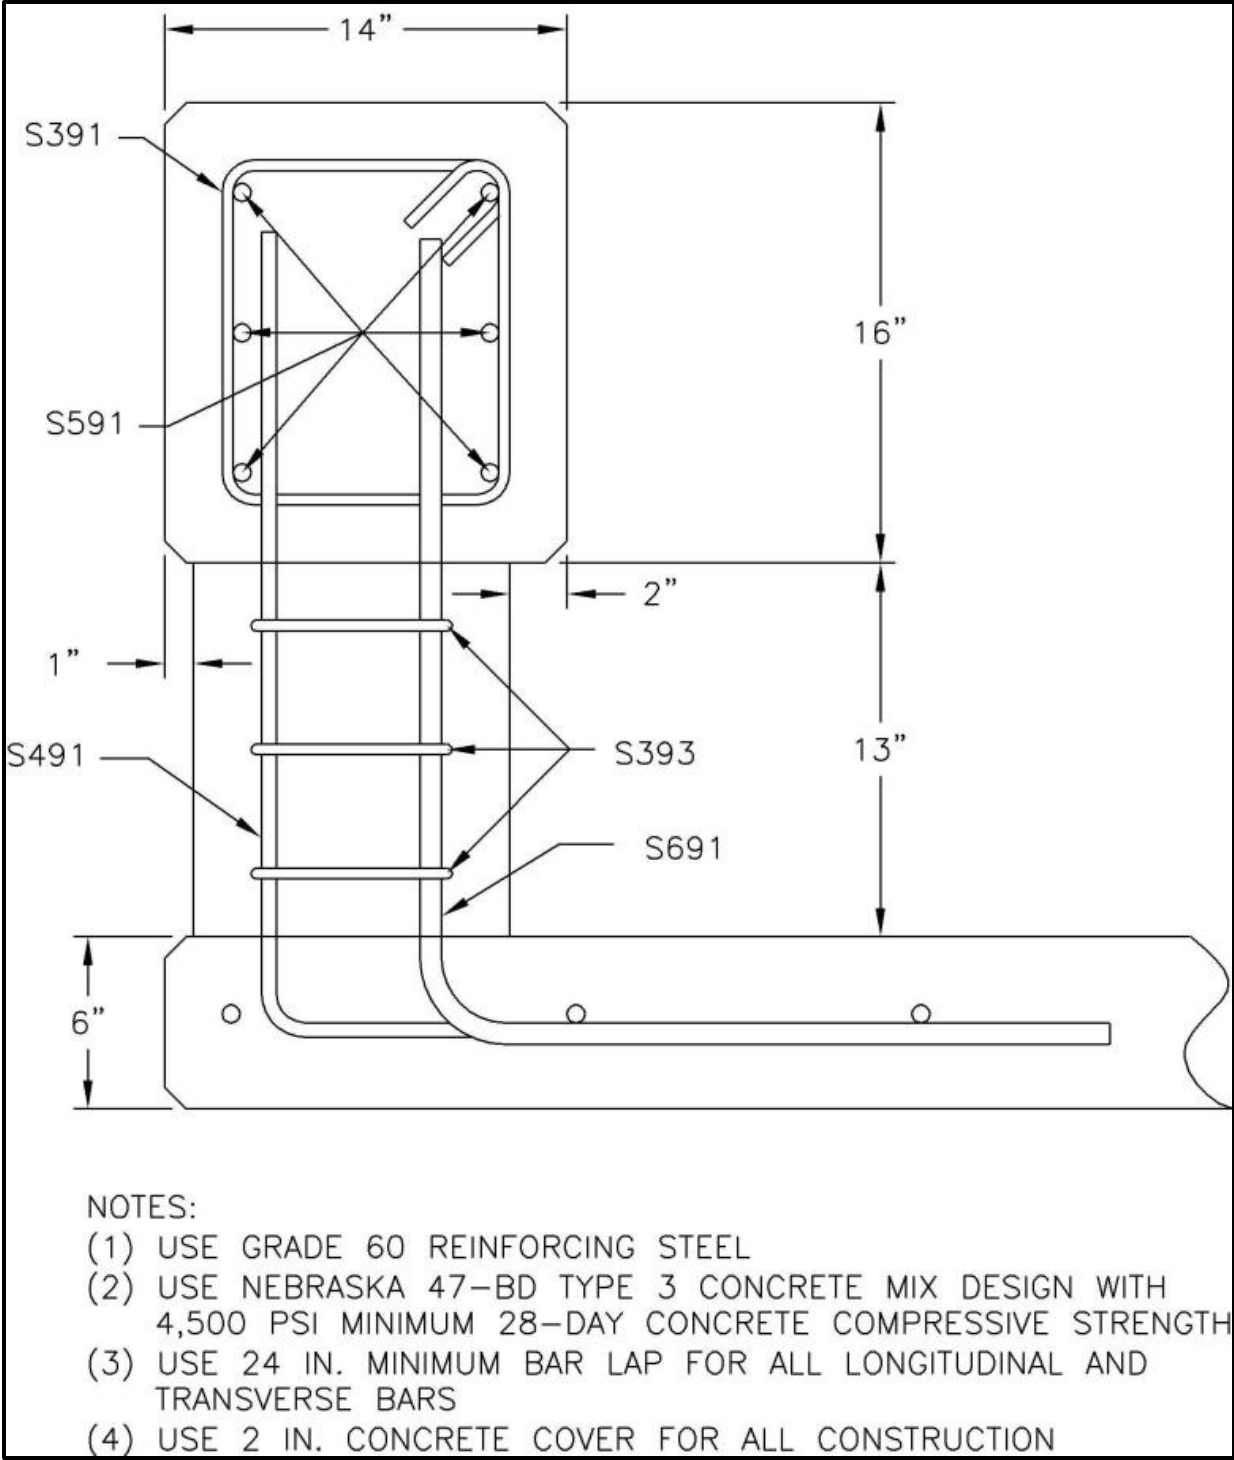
Cross Section of NDOT Open Concrete Bridge Rail on Thin Bridge Deck [9]
